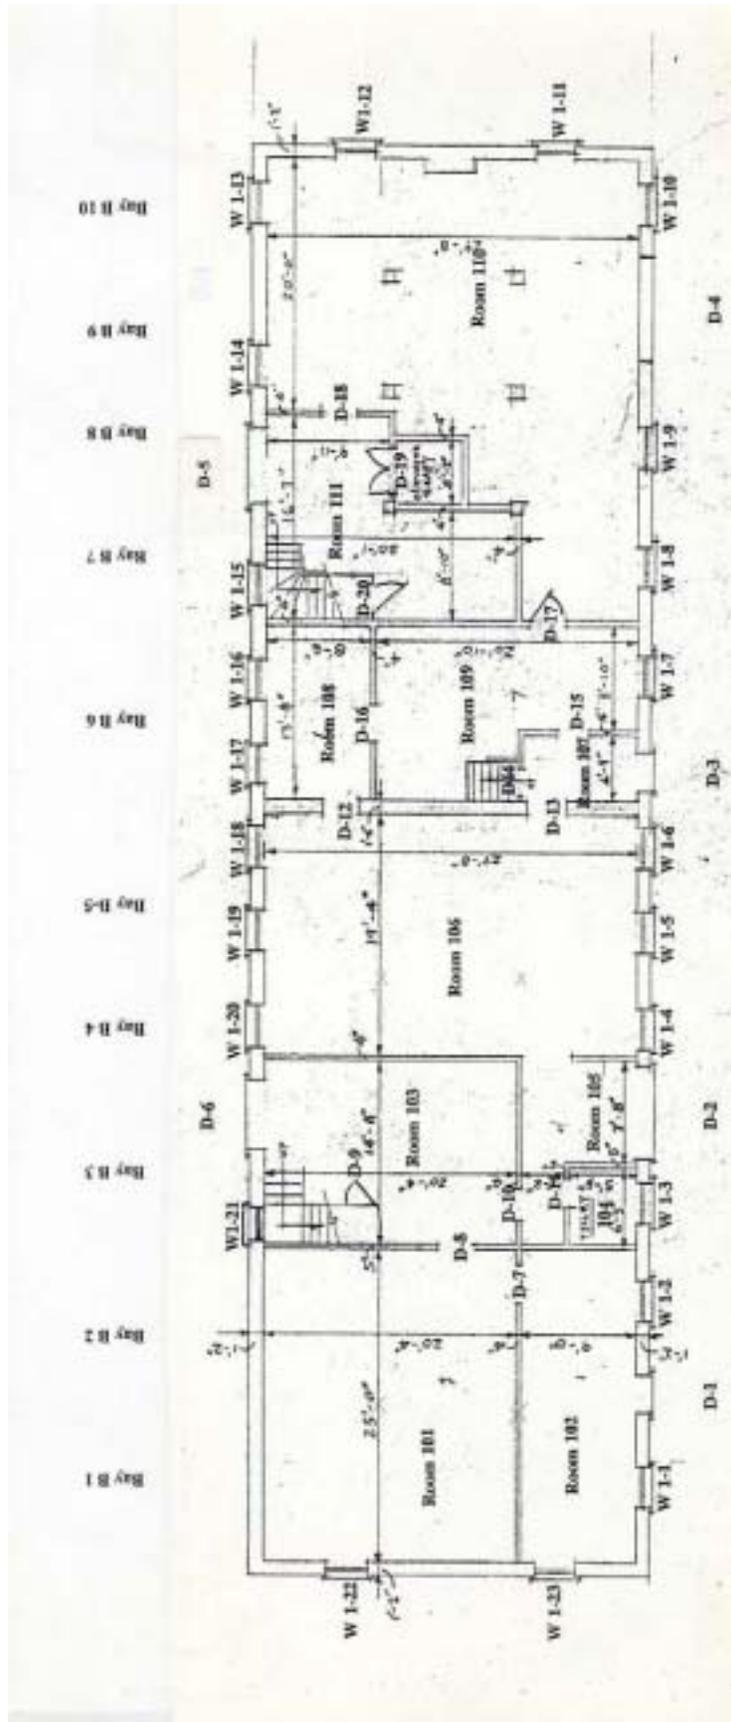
Plan of the first story with architectural features and spaces labeled [1993].
